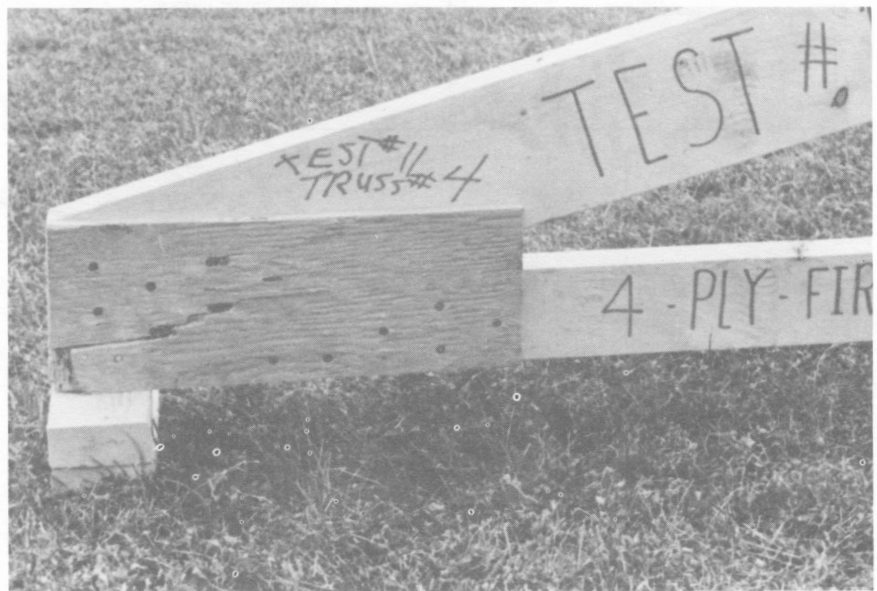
Series C four-ply D. fir plywood failure, a diagonal failure due to tension in the plywood gusset.
